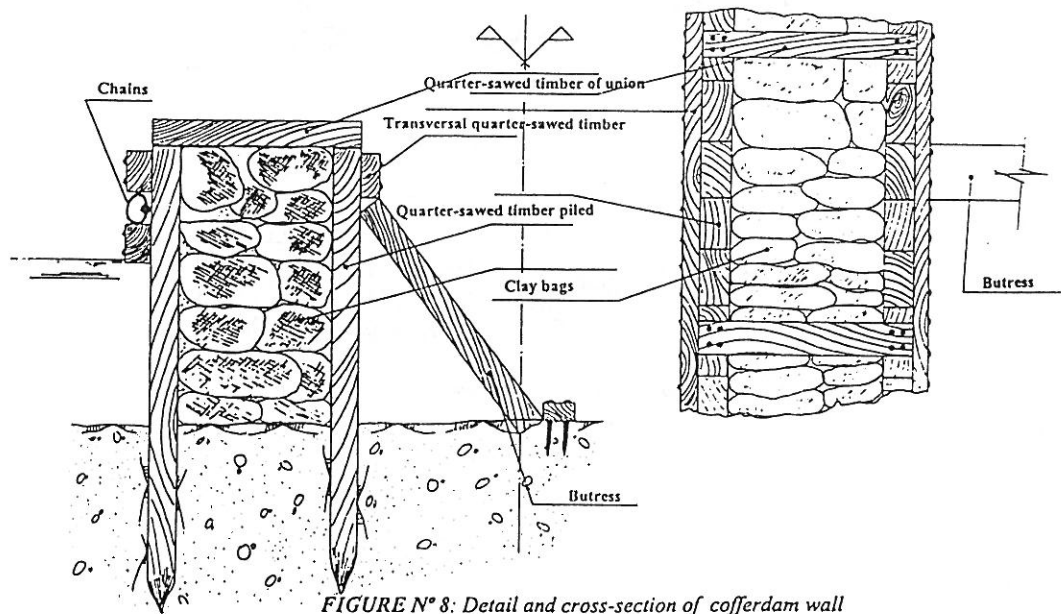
Detail and cross-section of cofferdam wall (de la Peña, Prada & Redondo '95, according to Vitruvio (5-13))
